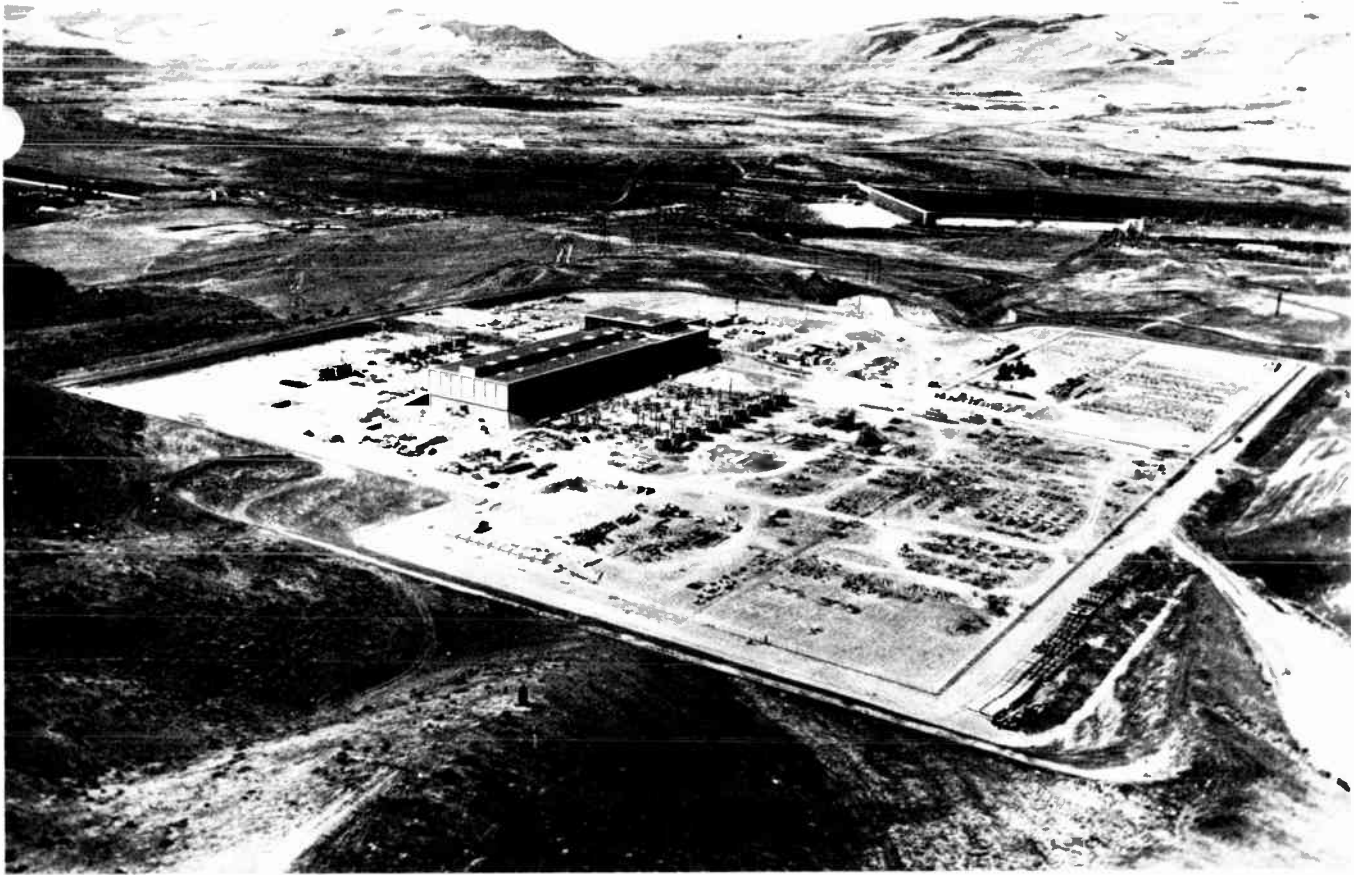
Aerial view of the Celilo Converter Station. The Dalles Dam can be seen in the background.
